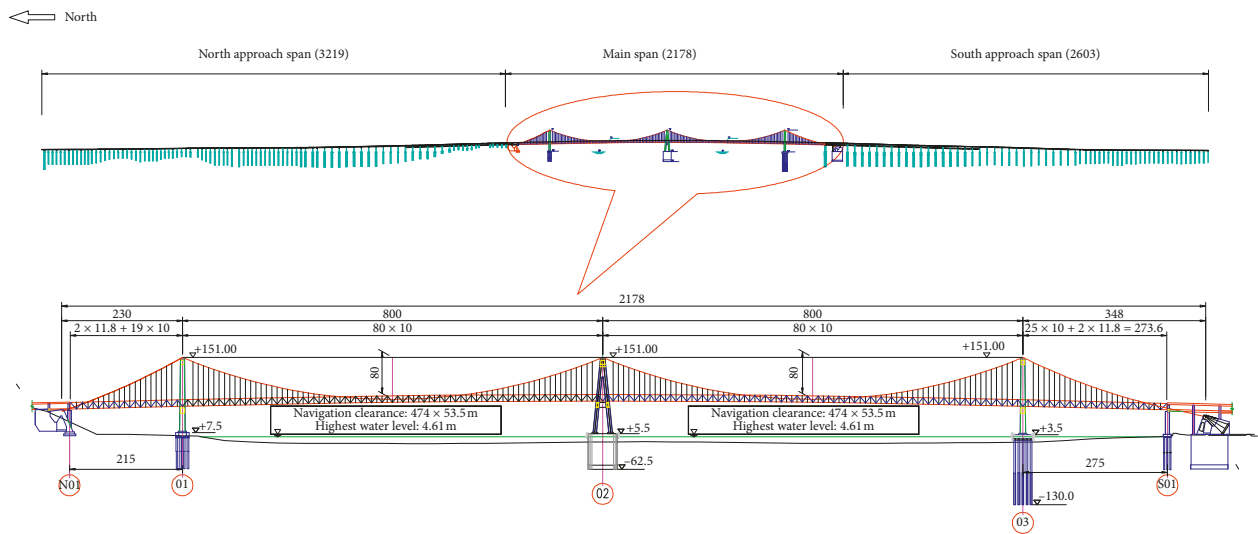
Ou River Estuary Bridge arrangement of main span and approach span (units: m).
